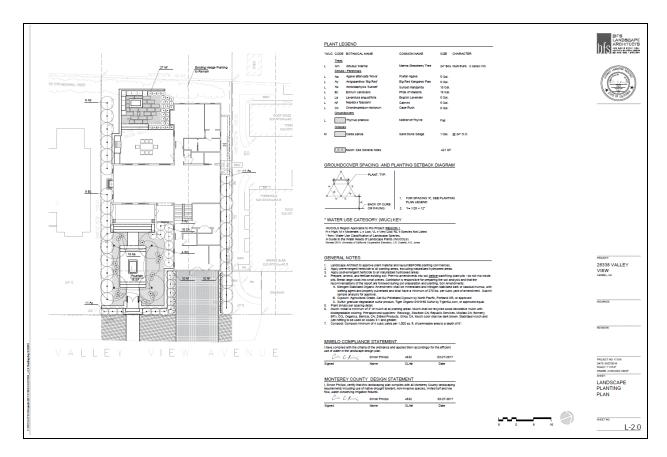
L-2: Proposed Landscape Planting Plan at 26338 Valley View Avenue
